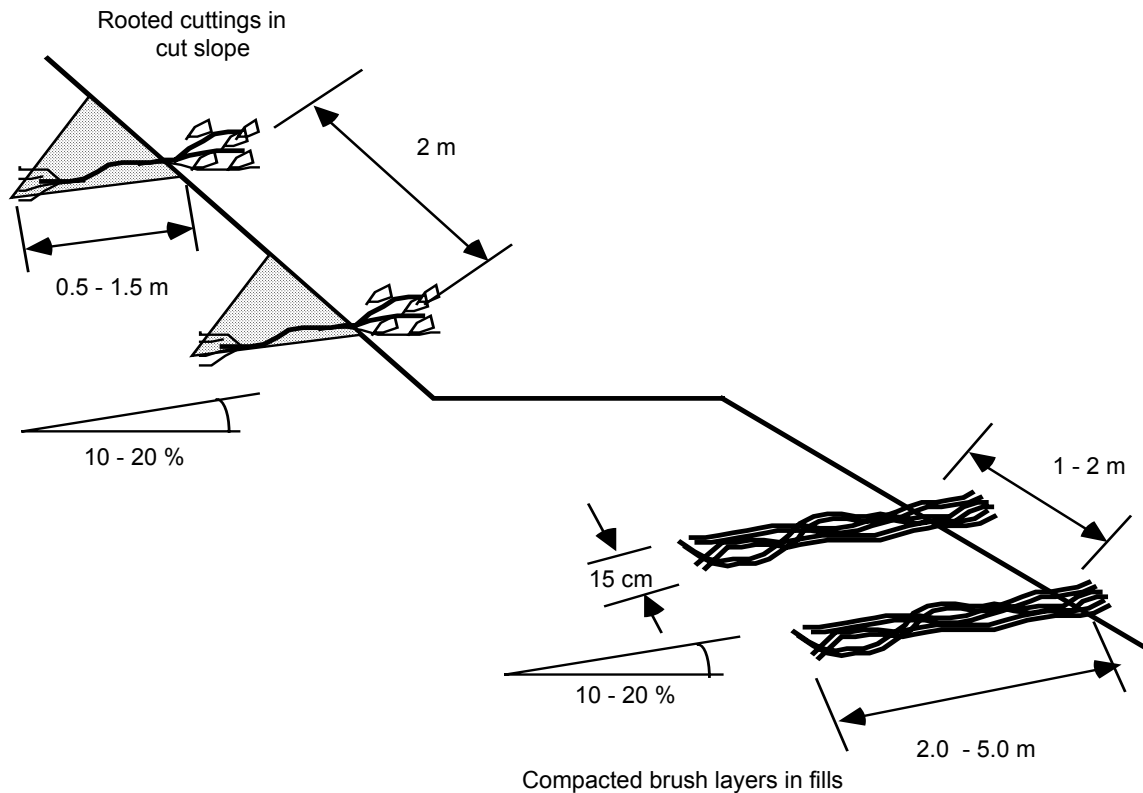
Brush layer installation for slope stabilization using rooted plants for cut slope and green branches for fill slope stabilization.
